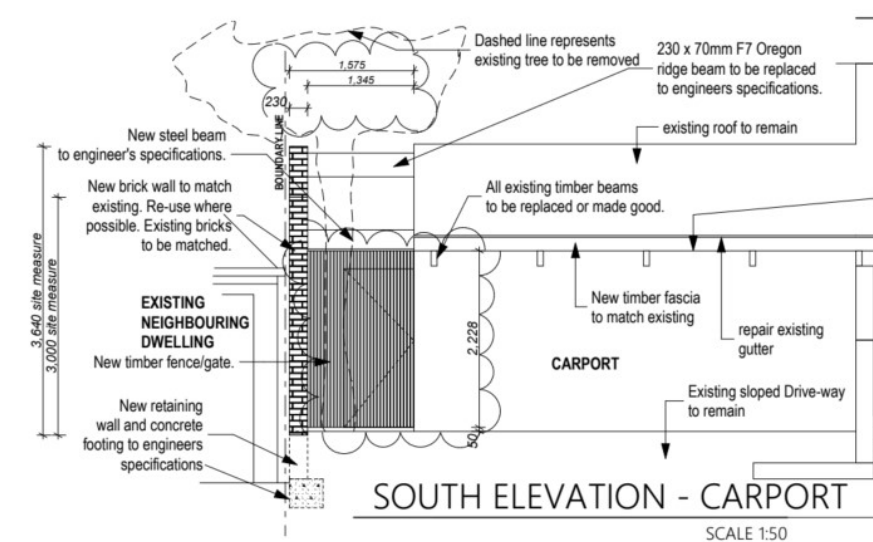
Detail from building permit plans for 'Carport Renovation, 1 Reid Street Beaumaris', showing no visual change to the carport. (Makro Design, 2019)
